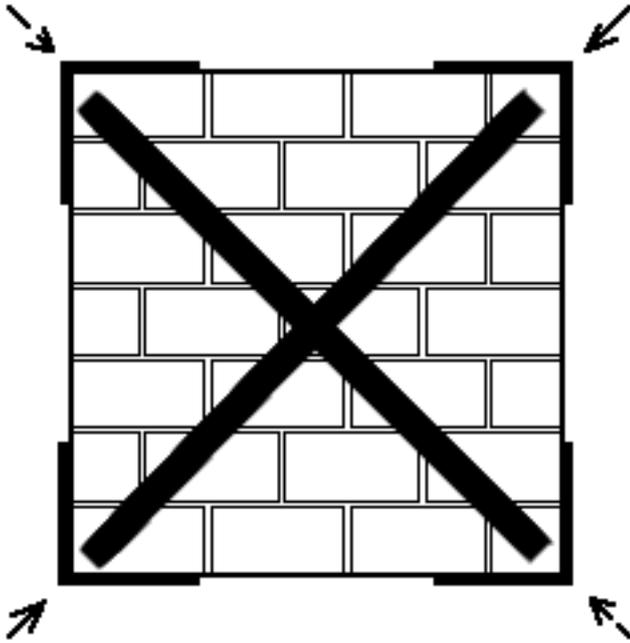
Test arrangement for diagonally reinforced panels under cyclic loading (CD).
